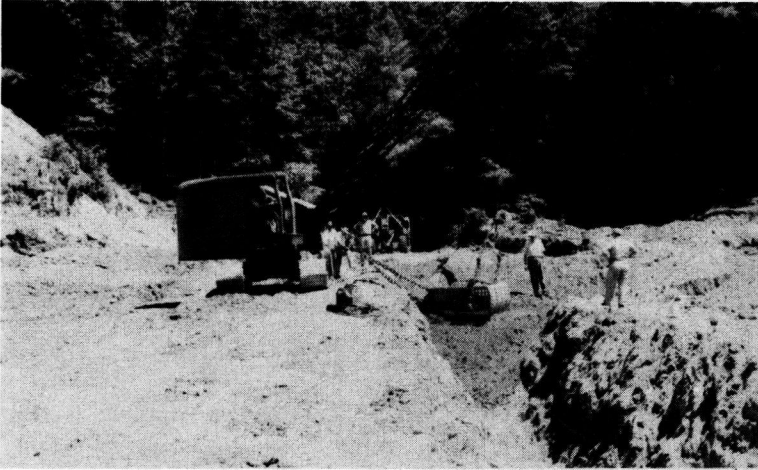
Refilling the imperfect ditch section with loose material. Facing north.
